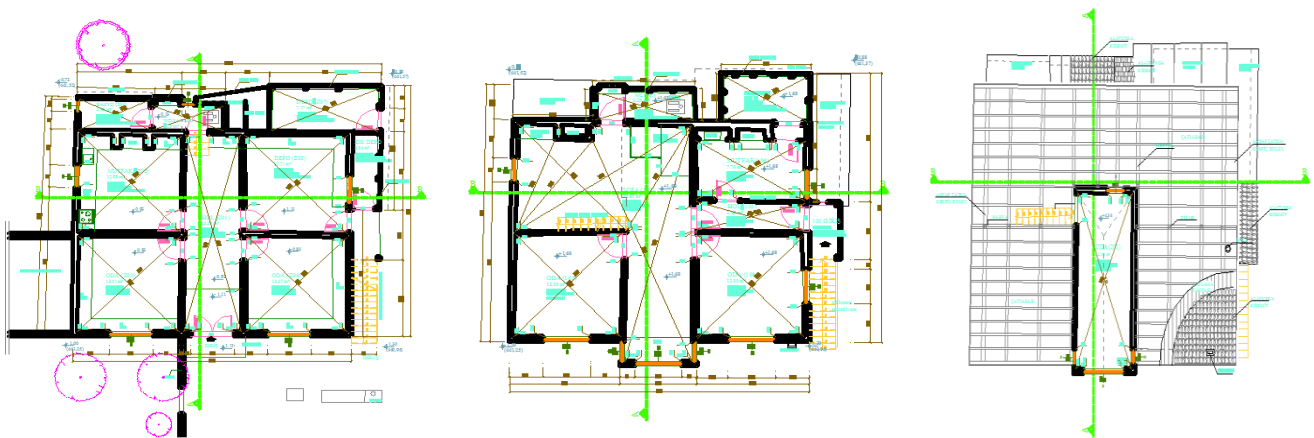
Halim Düzgün House's rollove ground floor plan, first floor plan and second floor plan
